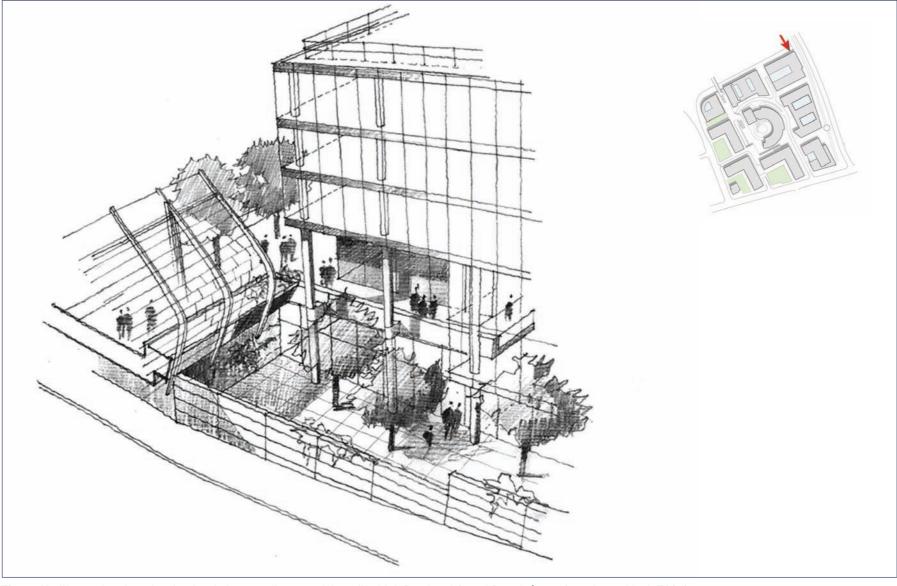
Illustrative view showing level change adjacent to Wyattville Link Road and Grand Parade/Luas Crossing at block TC3-3
